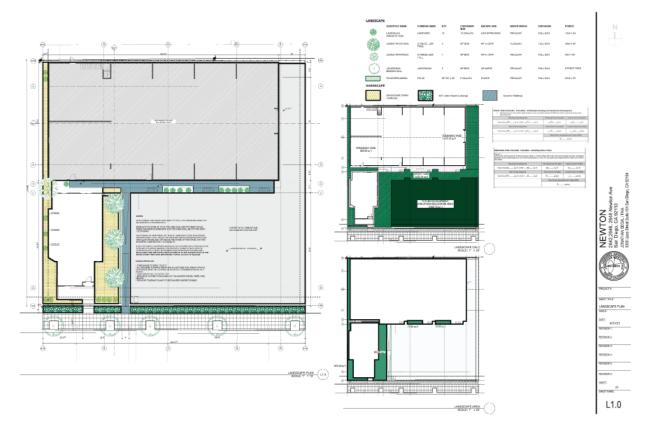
Proposed landscape plan at the Newton Avenue site. Source: Matthew Segal.
